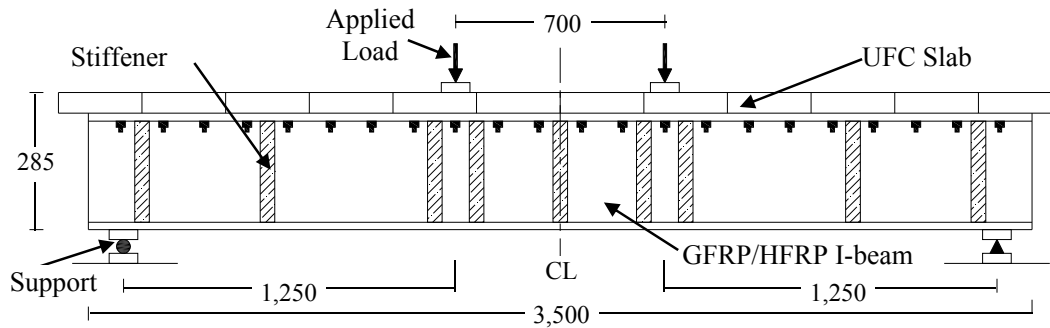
Elevation of the GFRP/HFRP and UFC composite beams (Units: mm)
